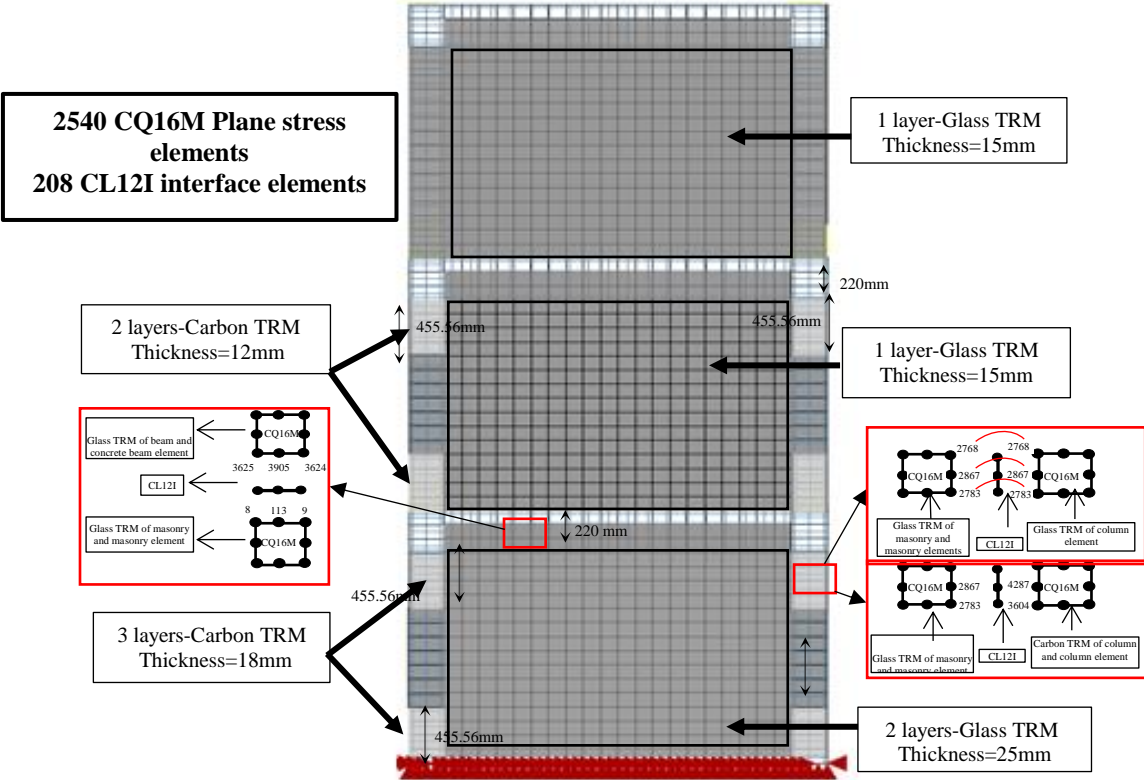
Geometry and mesh details of the masonry-infilled RC frame model with TRM.
